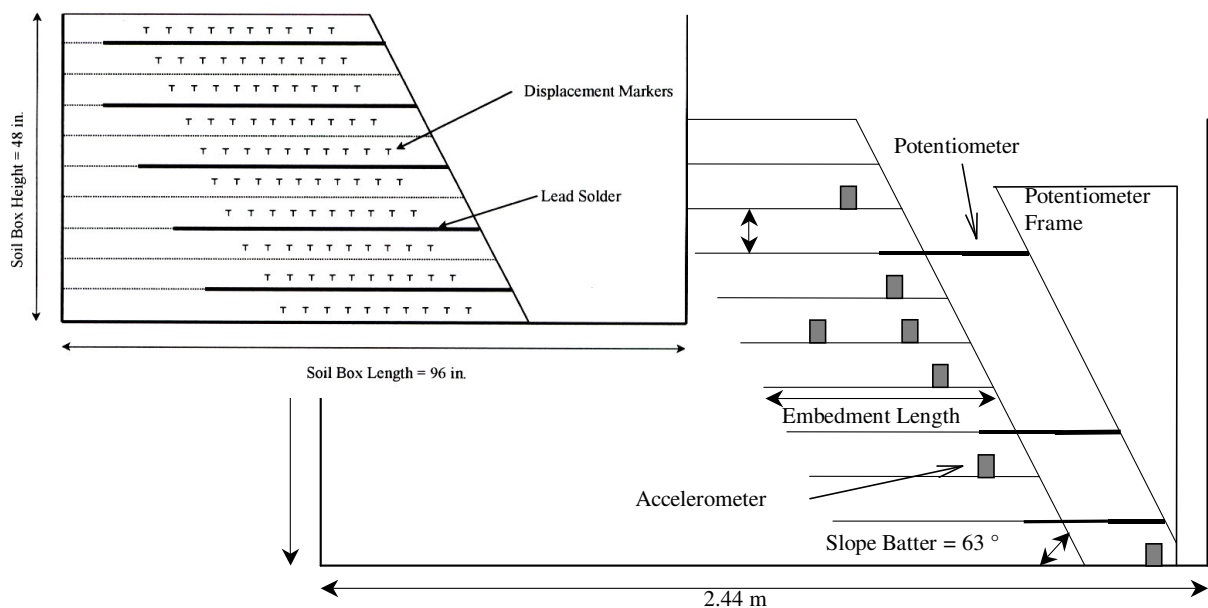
Sketch Example of Instrumentation Layouts of Shaking Table Test. (Perez, 1999)
